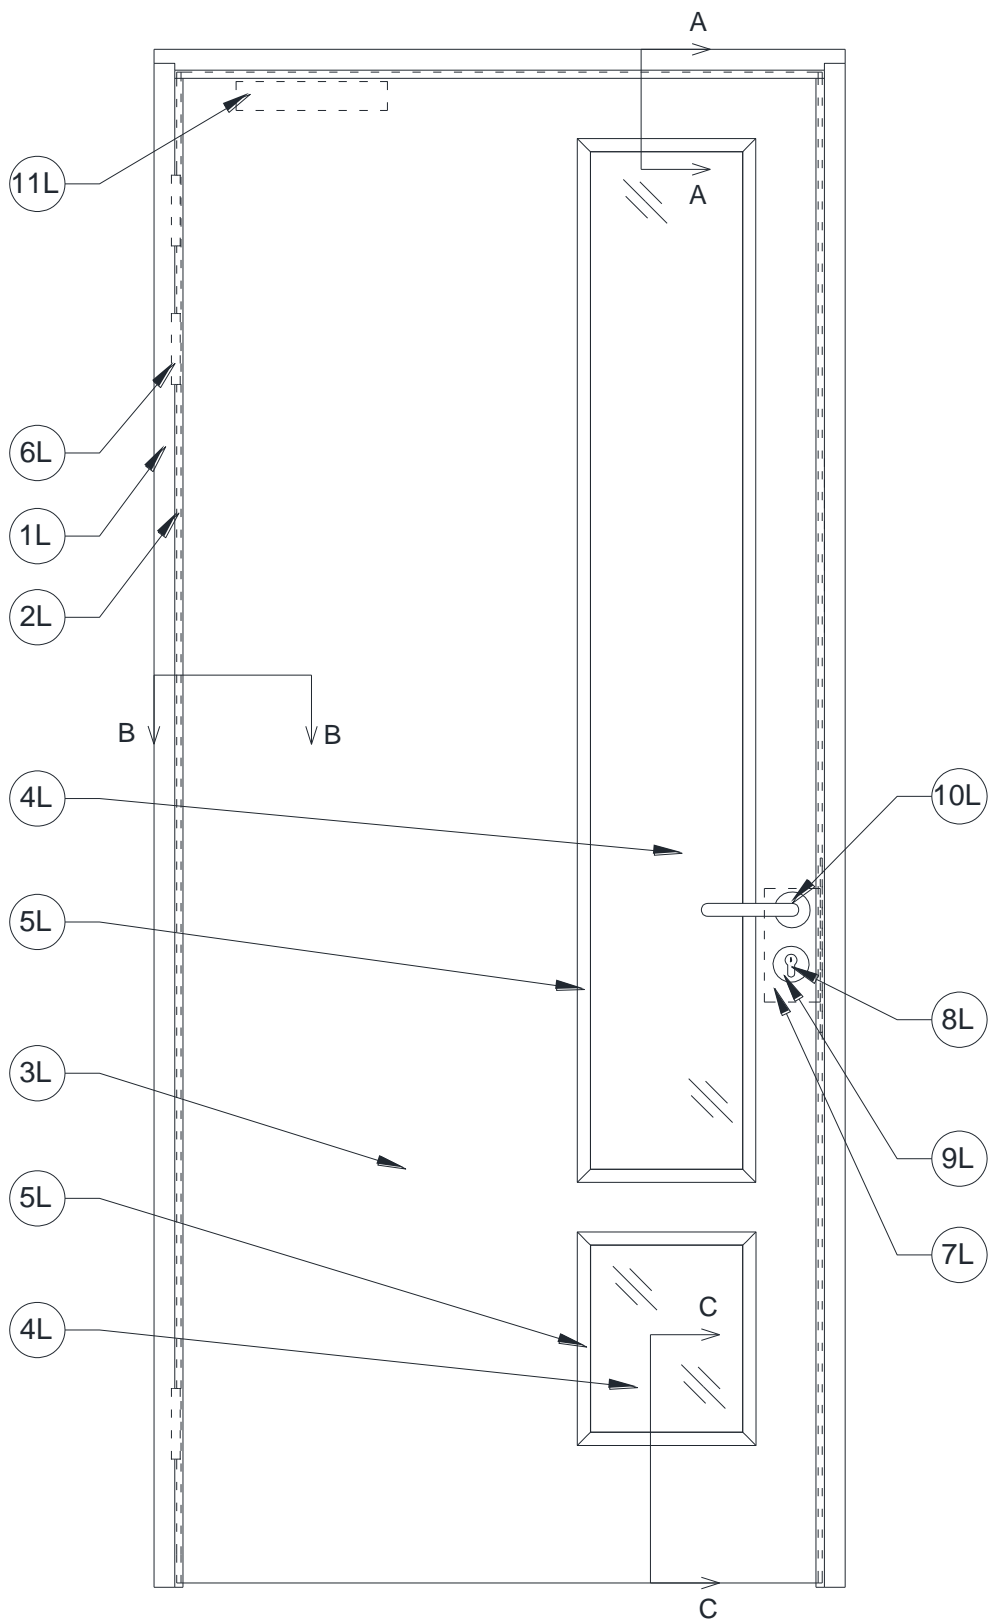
Left hand specimen elevation (unexposed face view) incl. hidden detail
